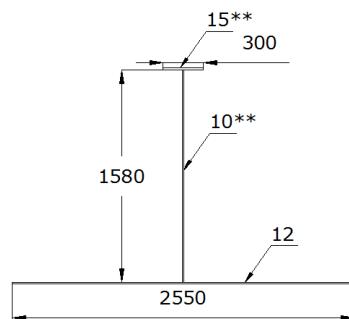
Cross section of the additional vertical beams, from 48 to 50.
